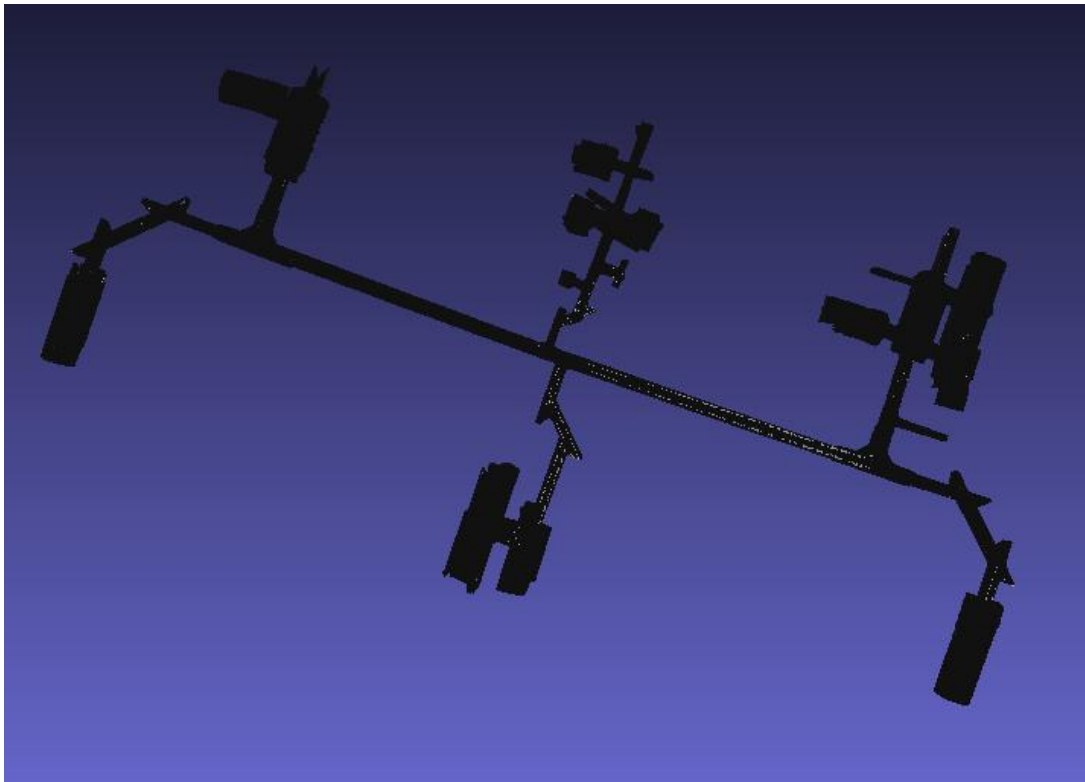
Macro view of the reconstructed surface model for Tunnel 92050.
